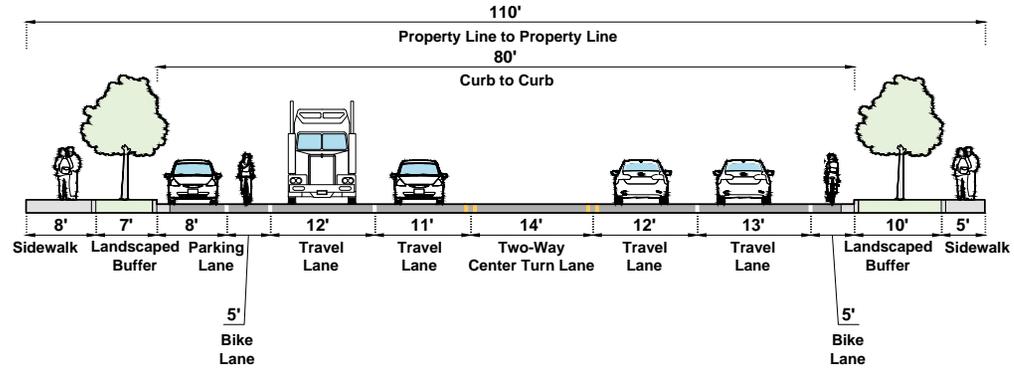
Cutting Boulevard (Channel Lumber to Boat Ramp Street) - Interim
